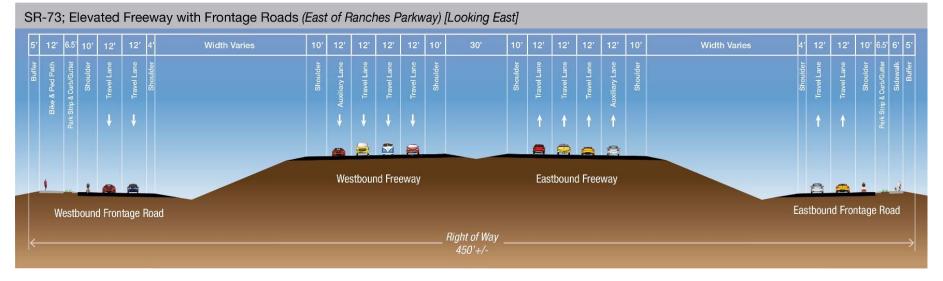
Typical Elevated Section East of Ranches Parkway
